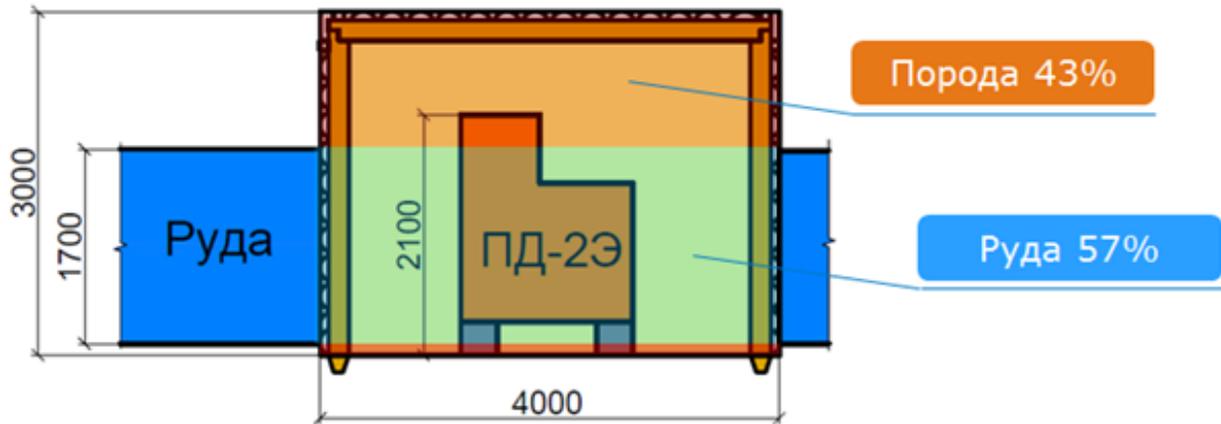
Typical cross-section of the stopes when the PD-2E unit is used for ore haulage
